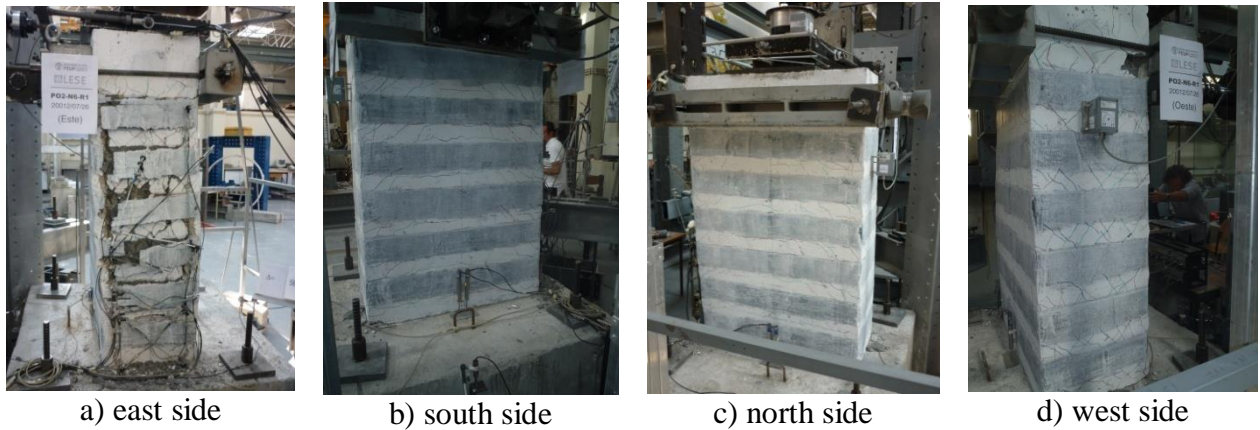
Final damage of pier PO2-N6-R1, for 3.0% drift.
